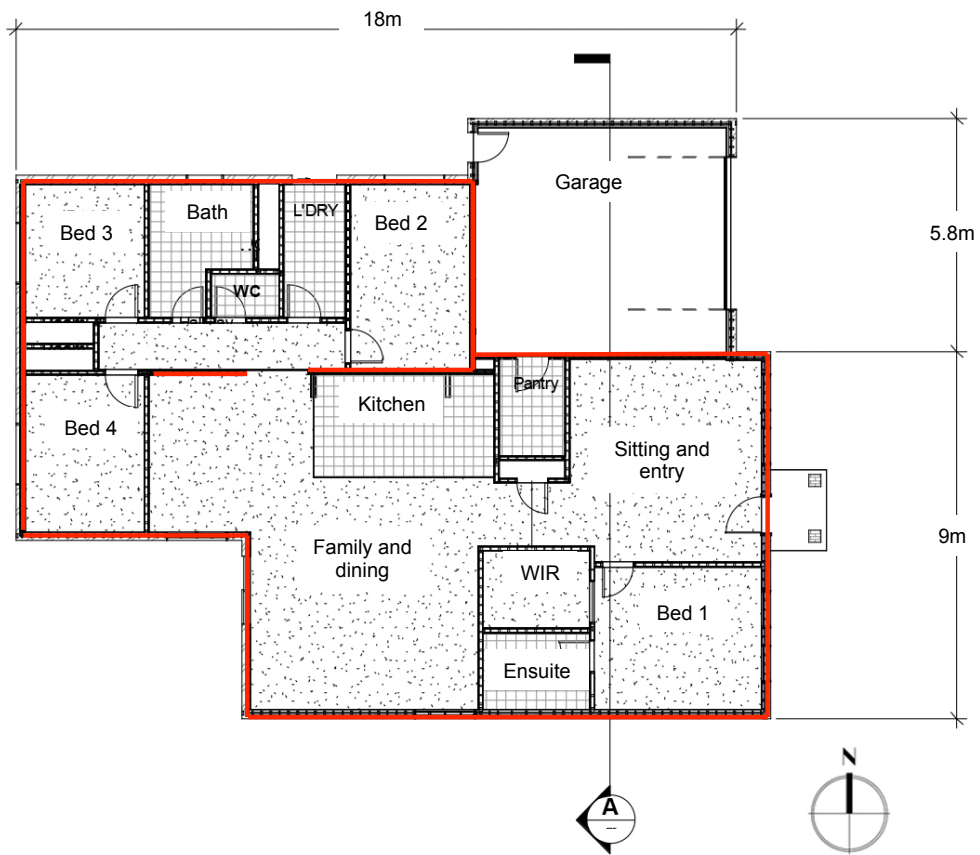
Plan of case study building with external wall insulation boundary highlighted in red
